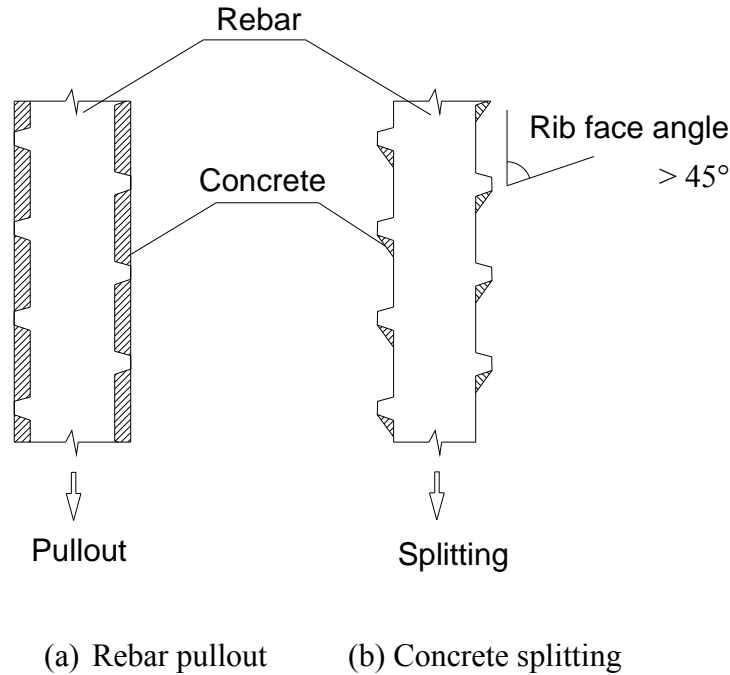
Schematic views of concrete-rebar interface conditions for rebar pullout and concrete splitting failure modes.
